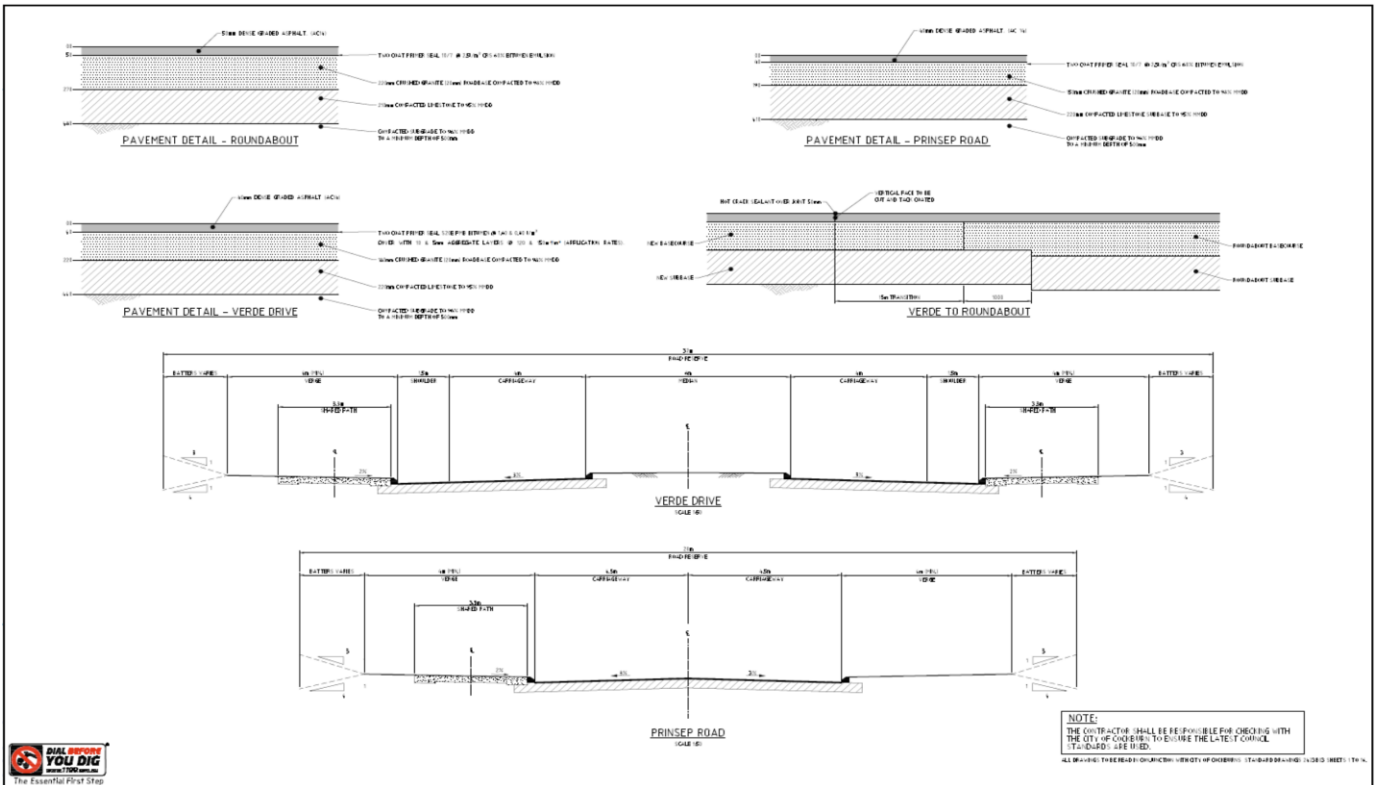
Typical Cross-Section, Source: Project document; the detail design of Road Template
